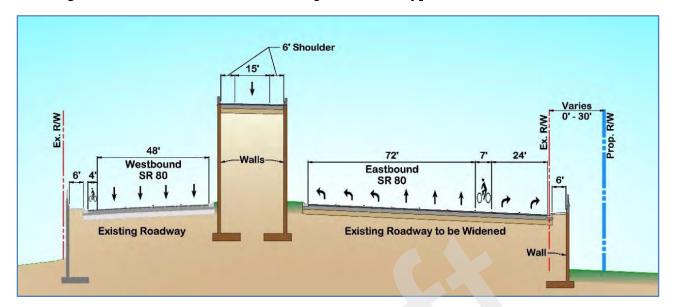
Build Alternative 1 - Proposed SR 80 Typical Section West of I-95
